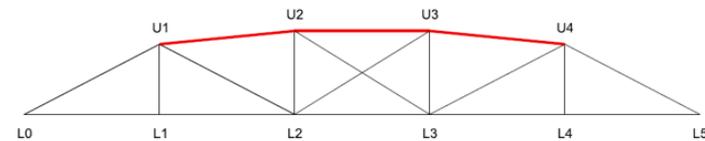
Overstressed Truss Members (Spans 1, 5, and 6) – Rehabilitation with Widening
